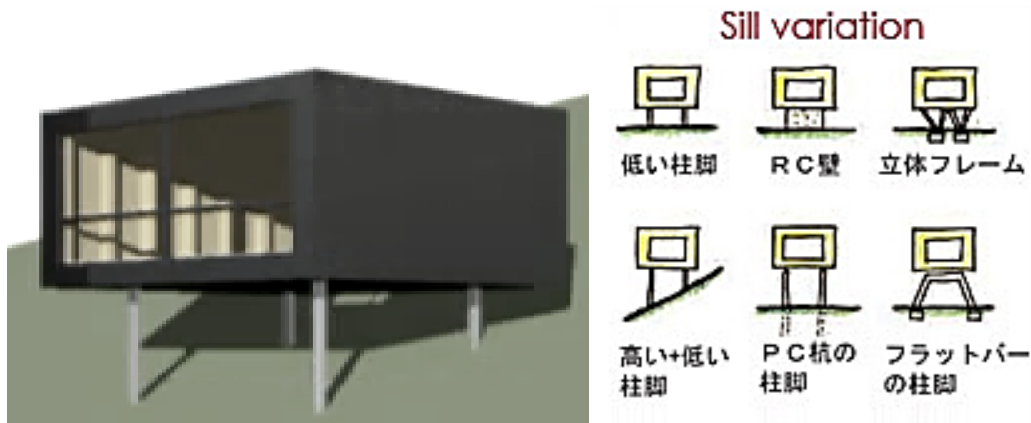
Adaption to various terrains of Aero House (<http://www.youtube.com/watch?v=A1P4aUkNIus> & <http://www.aerohouse.net/>).
